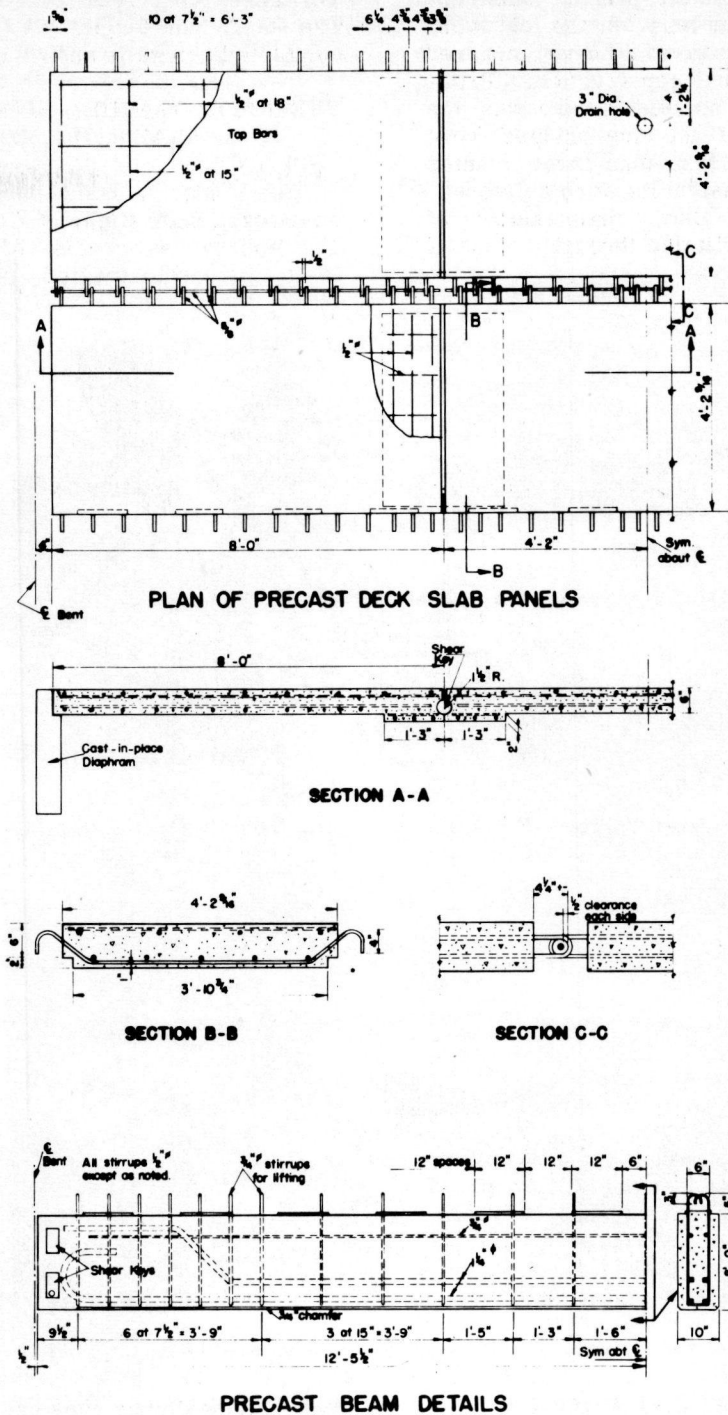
Baker River Bridge, State of Washington - Details of Precast Deck
